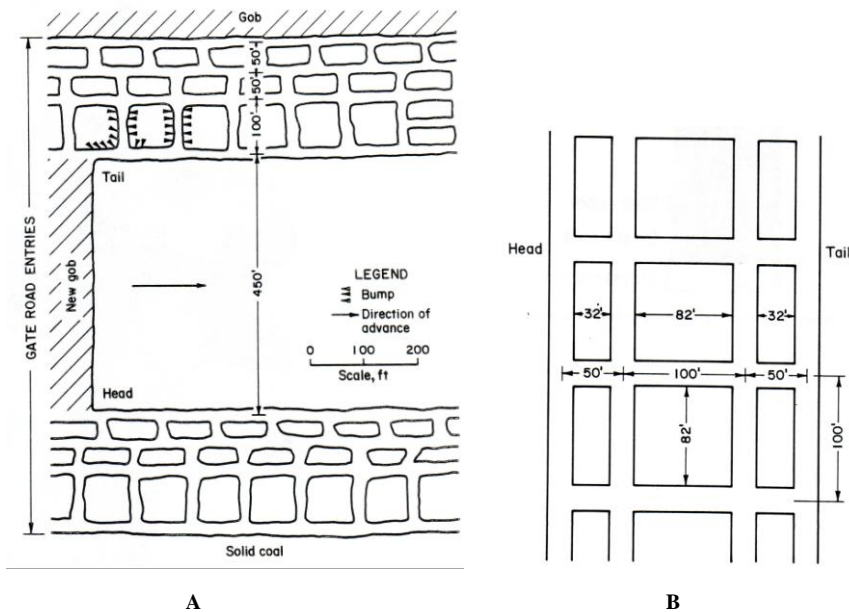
Four-entry gateroad systems: A, abutment pillar next to tailgate B, abutment pillars at the center
